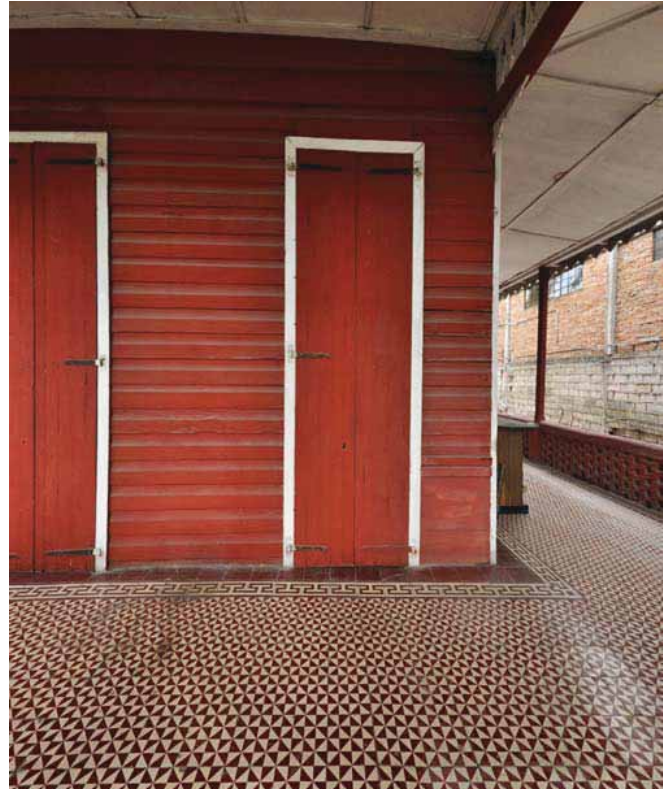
The house at 24 Avenue Lamartiniere, showing the characteristic shiplap siding of the braced timber frame Gingerbreads, as well as simple undecorated doors common in all construction types, and an unusually ornate tile surface on the lower porch.
